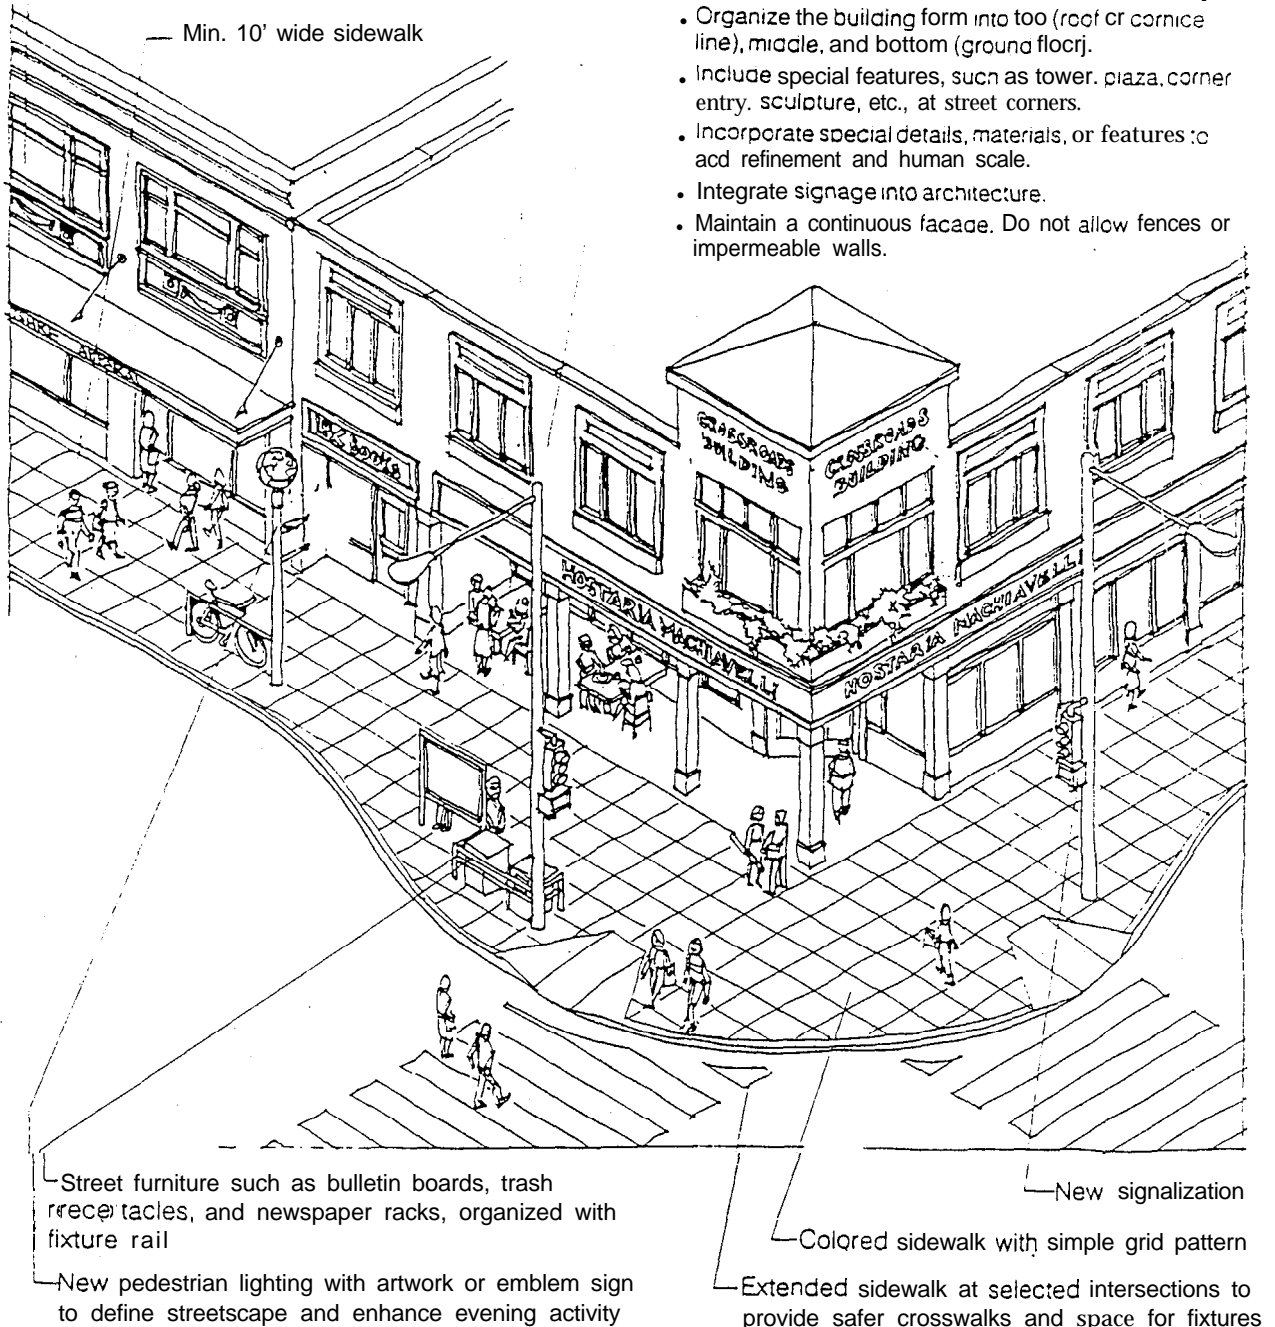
Guidelines for Façade and Streetscape improvements on New and Existing Buildings
